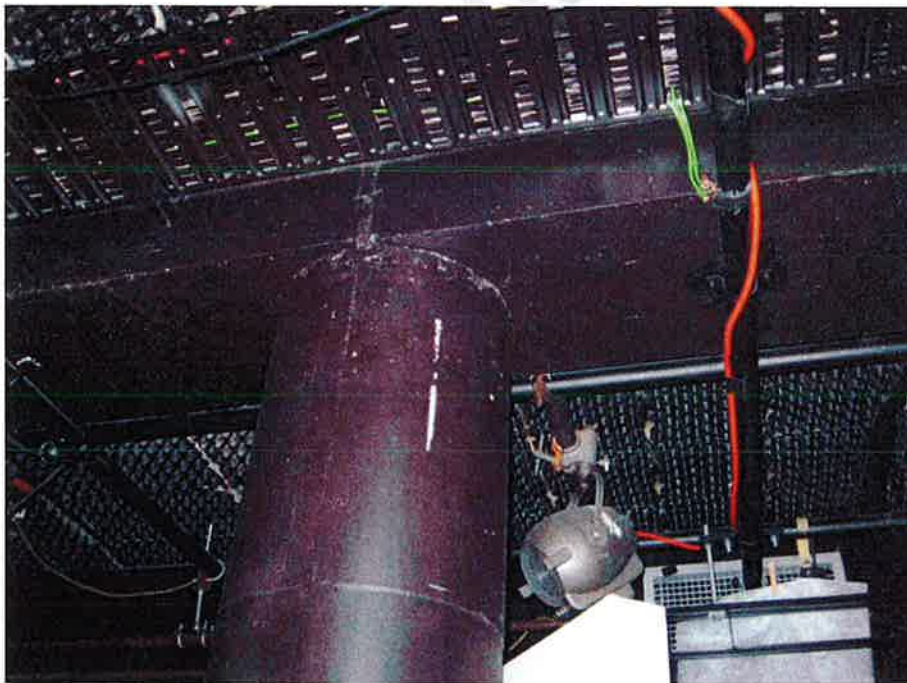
Level 1 Line 2 or 3 400mm diameter column and beam after 4 September 2010 Earthquake. No visible cracking evident. A horizontal circumferential formwork mark can be seen approximately 600 mm down from the underside of the beam.
